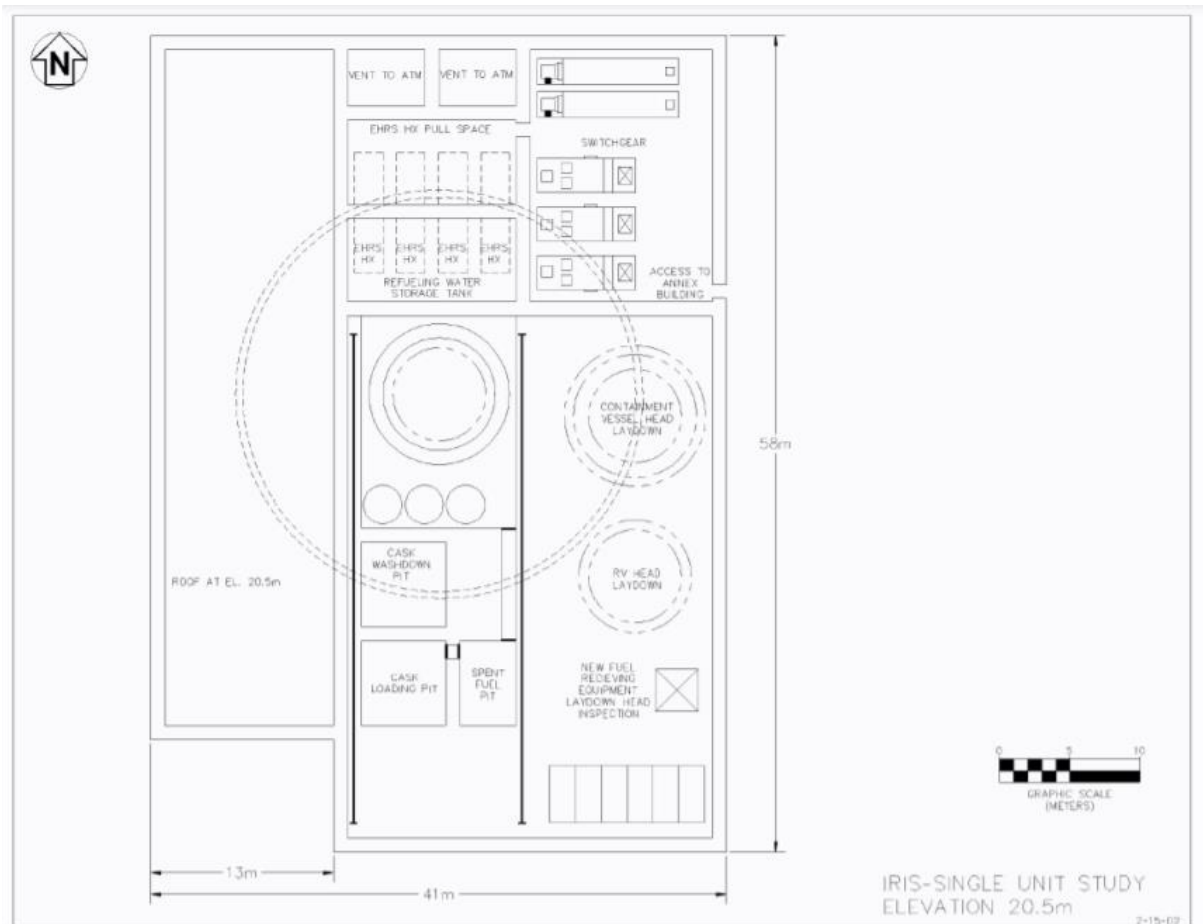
IRIS Auxiliary building layout at elevation +20.5 m
